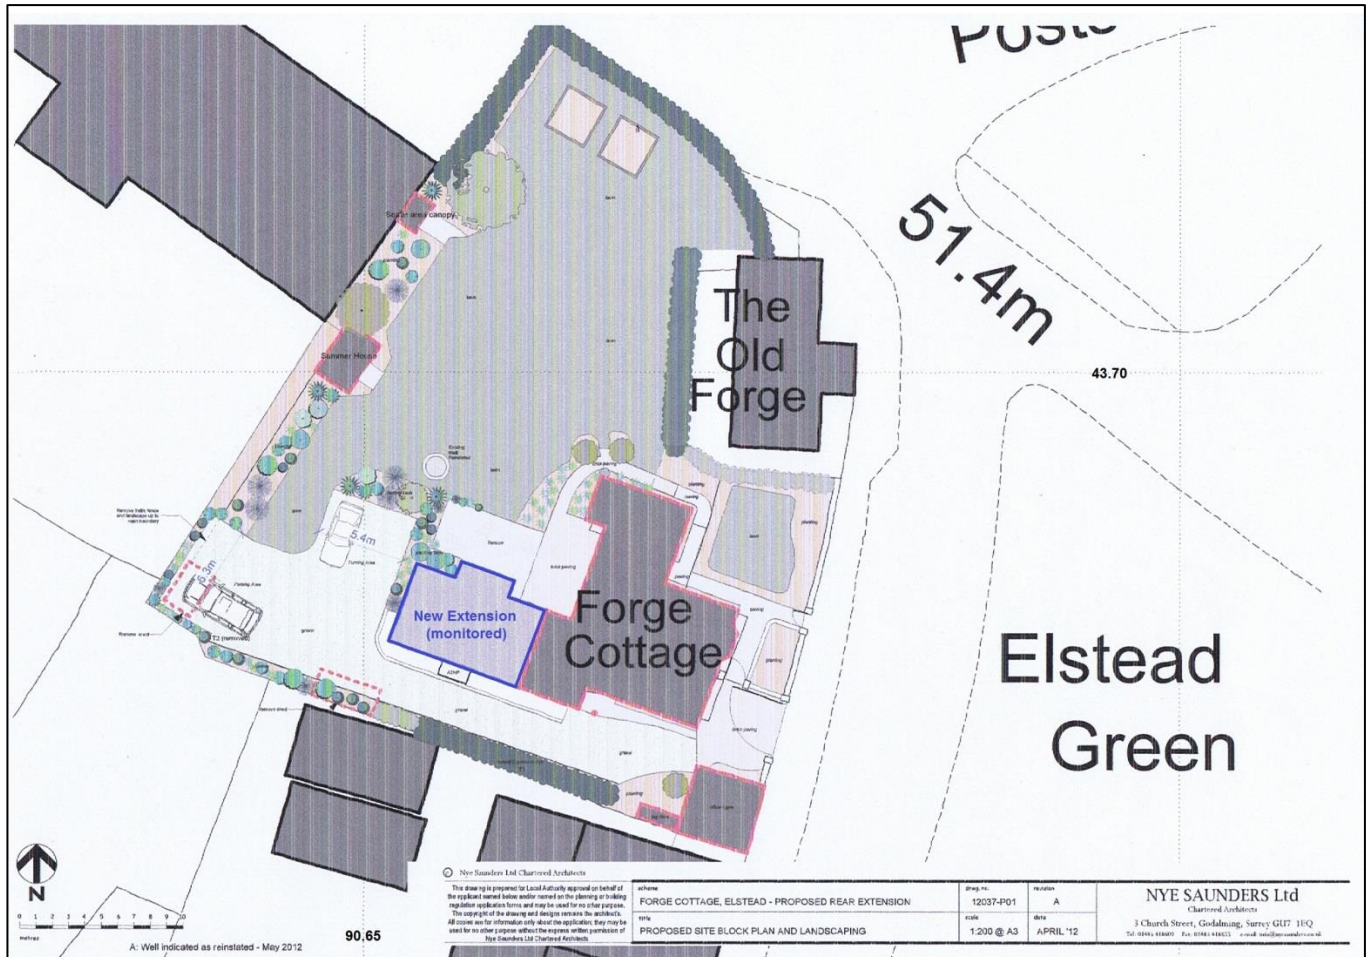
Forge Cottage, Elstead: Site Plan showing location of new extension (Adapted from Architects drawings)
